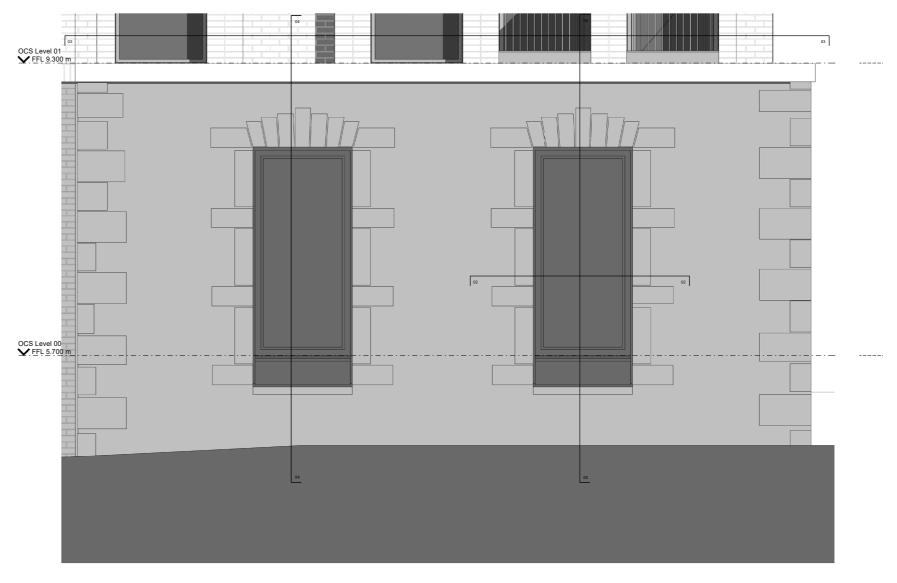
Detail of the riverside elevation, including typical opening in the existing wall. Refer to A-300 series for further details
